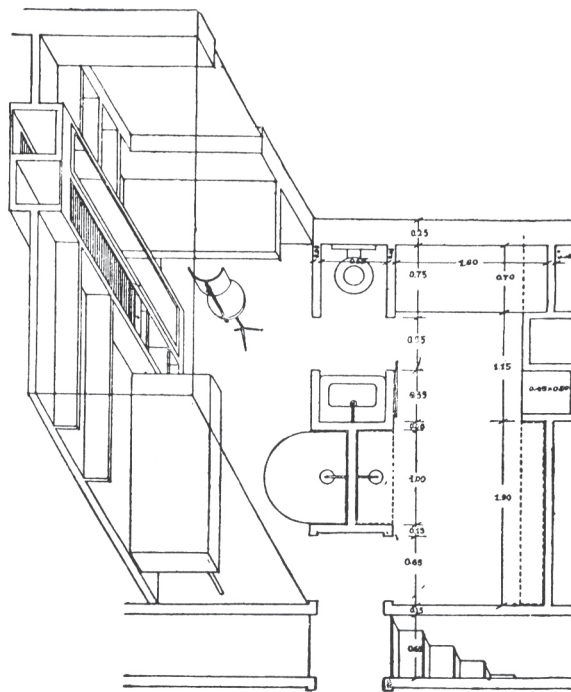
Axonometric view and plan of two cubicles with shared bathroom within a habitable wall; from Teige, *The Minimum Dwelling*, 358.
